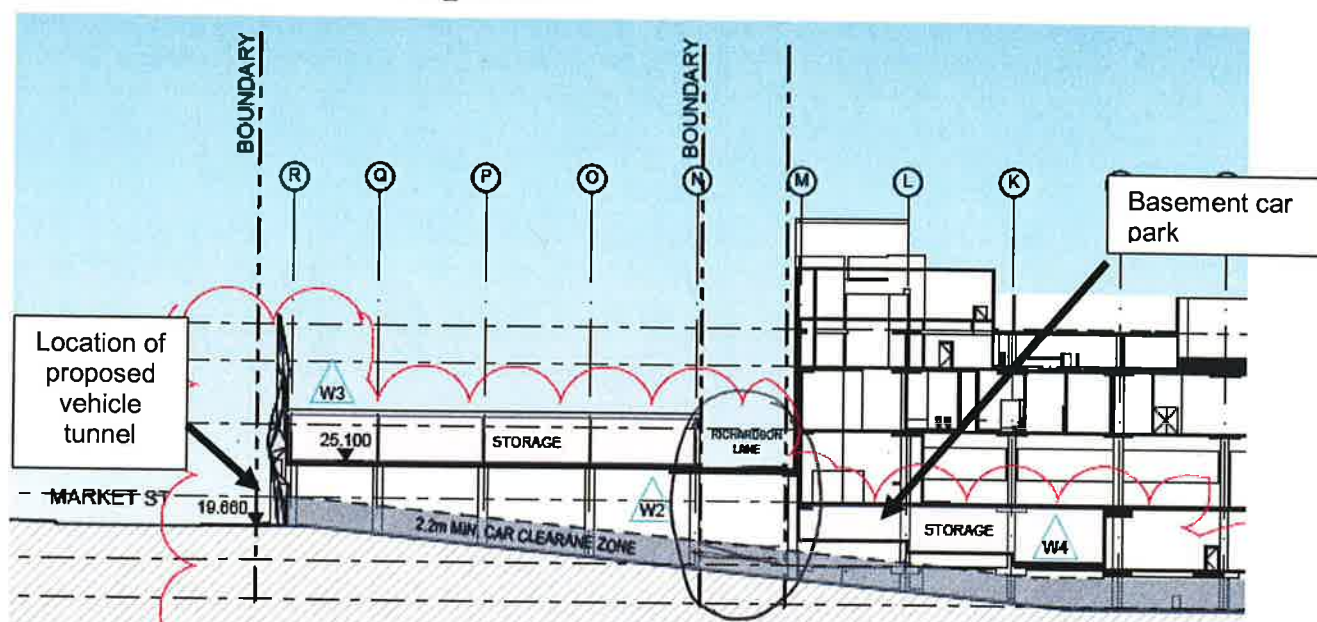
Section illustrating proposed new vehicular entry/exit along No. 71 Market St (source: Proponent's S75W EA)
